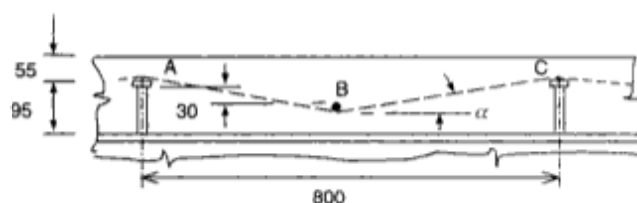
Level of bottom transverse reinforcement (dimensions in mm)
